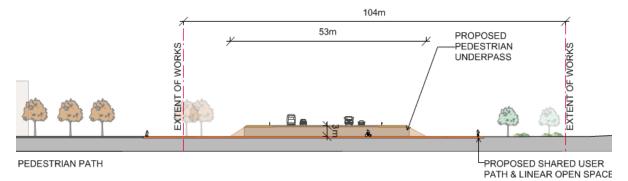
Cross section F with proposed standard mitigation culvert underpass at Park Way shared user trail and Braeside Park western entry, looking north
